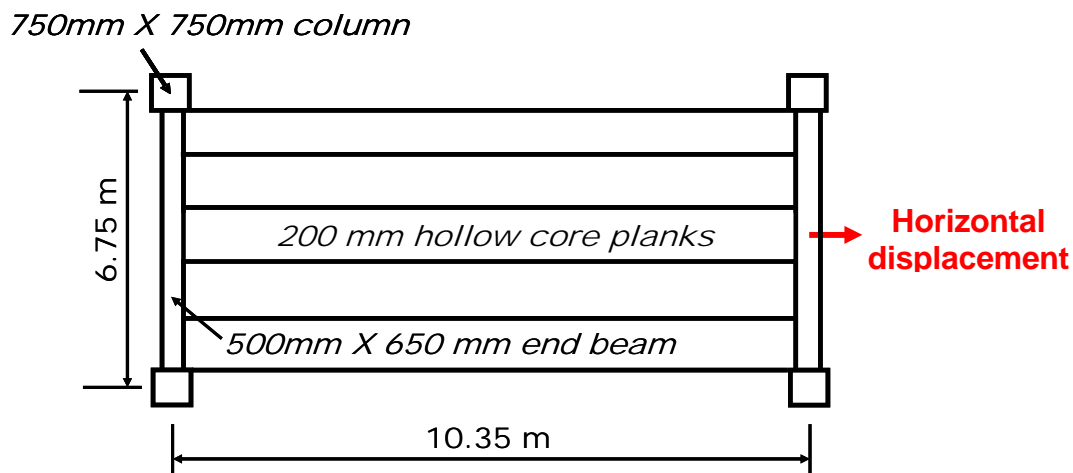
Plan view of one bay hollowcore flooring system with no side beam
